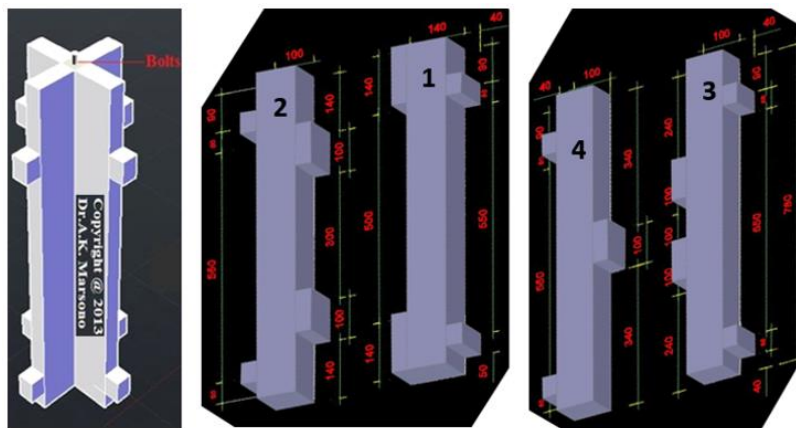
(a) Assembly IBS Block Work Column, and (b) detailing of components 1 & 2, and (c) detailing of components 3 & 4 – All dimension in (mm)
